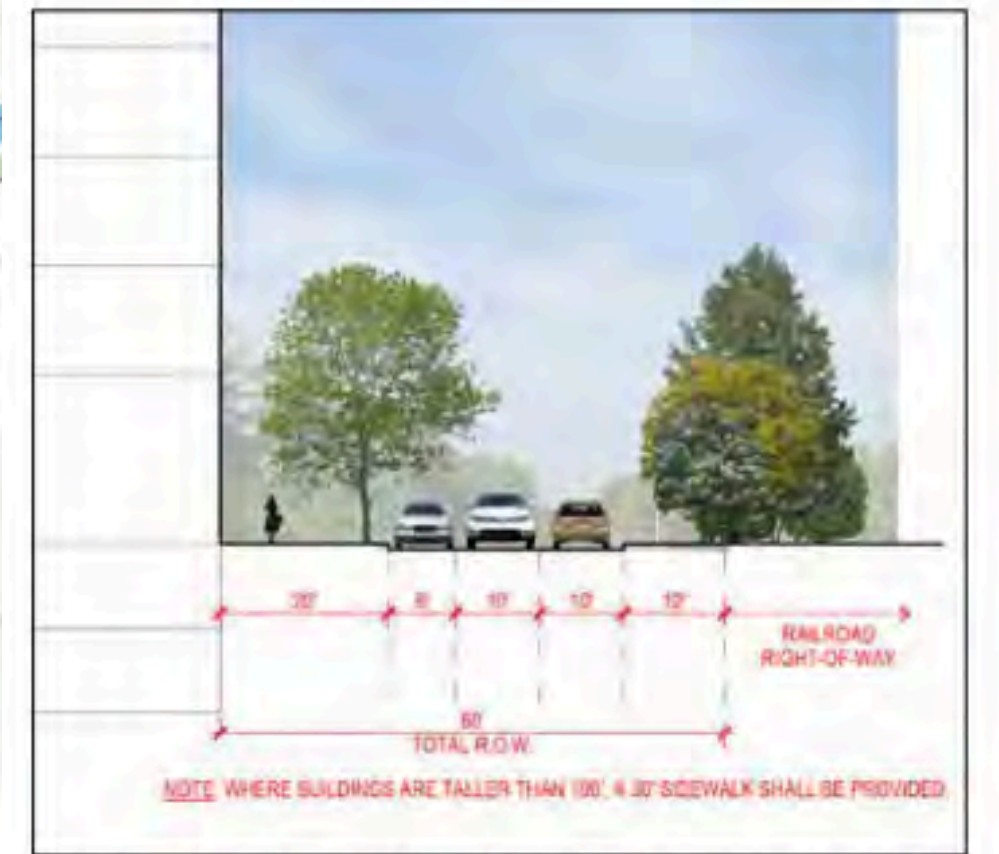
Cross section through typical "P" street with railway frontage
